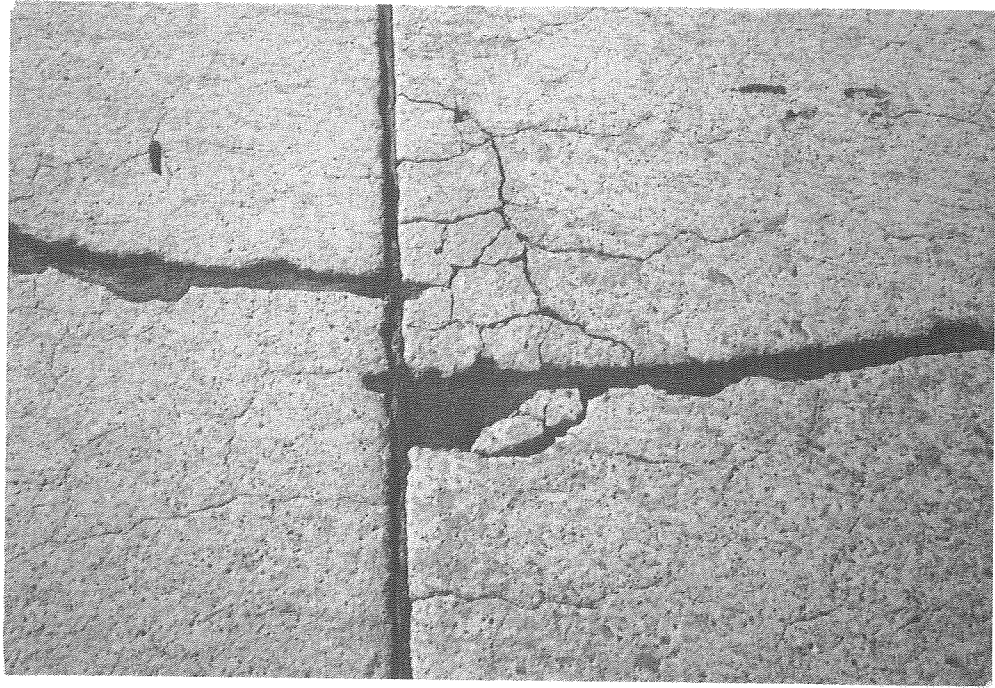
Typical Severe Cracking of the PCCP Near Joints
